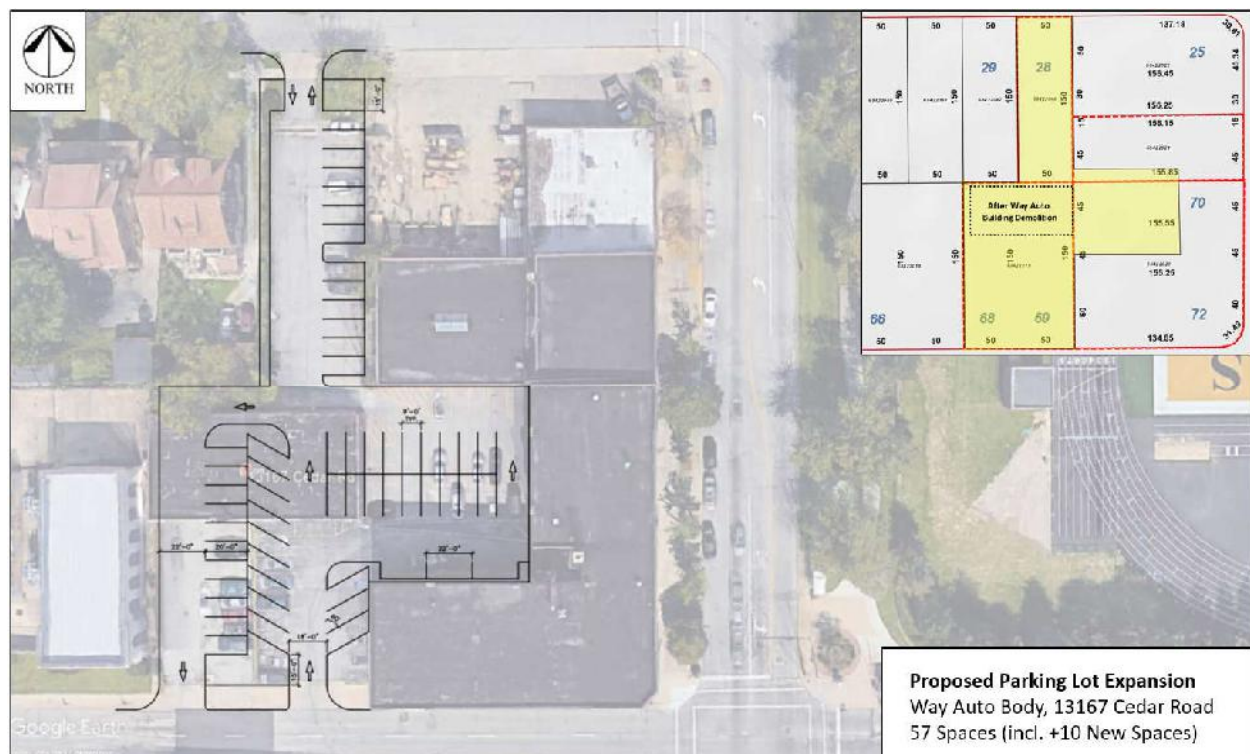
Conceptual Layout for Proposed Construction of New Parking Lot (13151-13159 Cedar Road)
